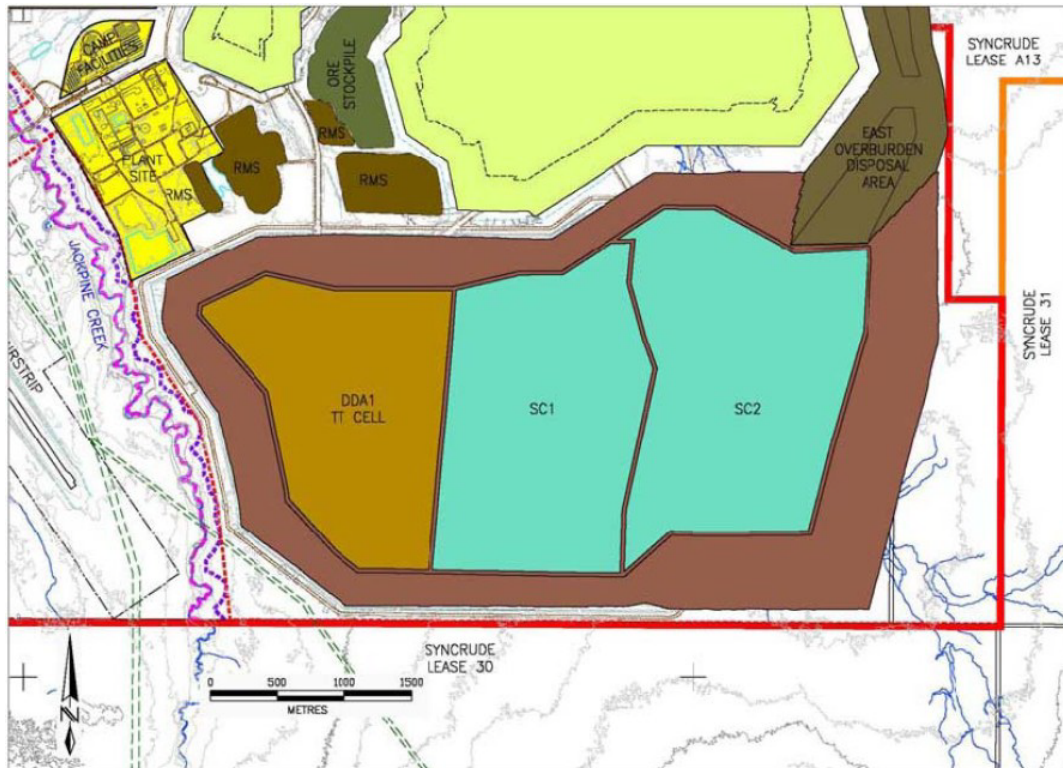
Layout of dedicated disposal area 1 within the JPM external tailings facility (Shell-Canada, 2011).
